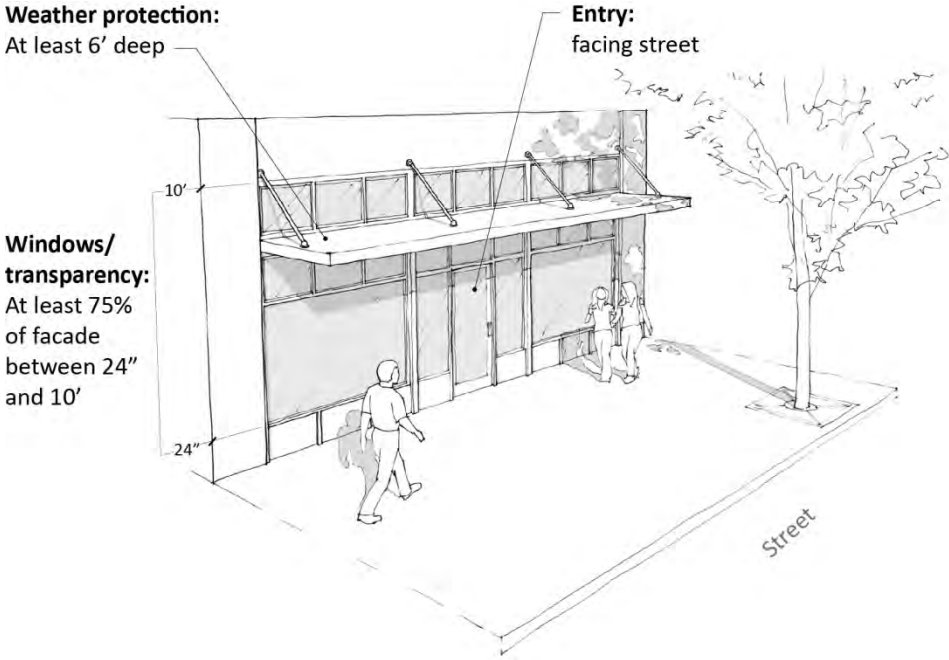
Examples of Building Orientation to Streets/Open Space Treatments
